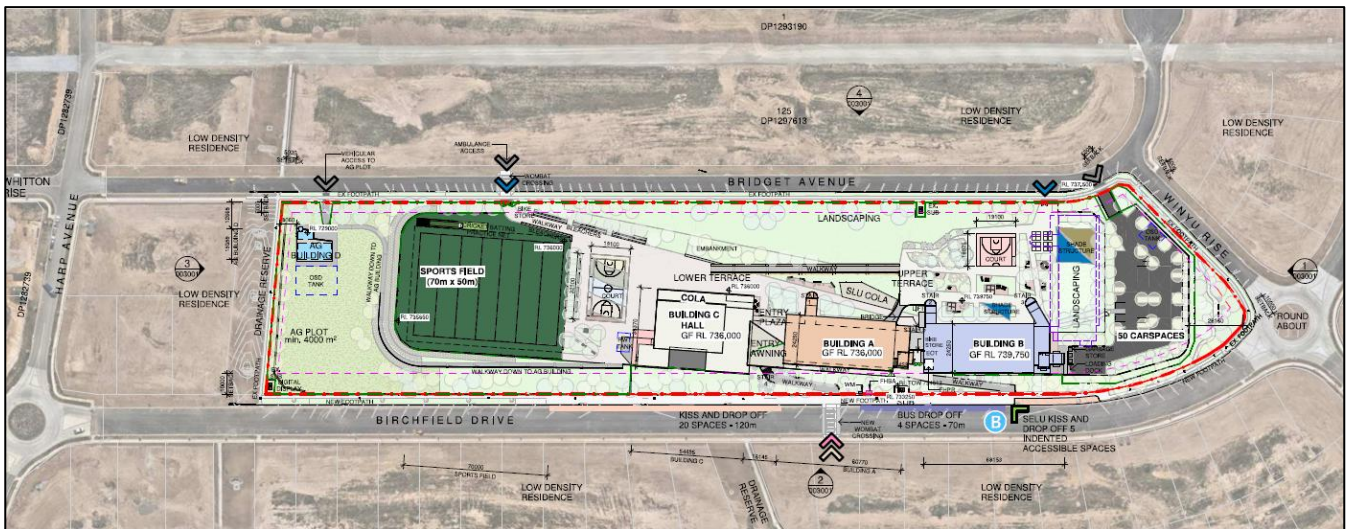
Site Plan (Source: NBRS, Feb 2025)
